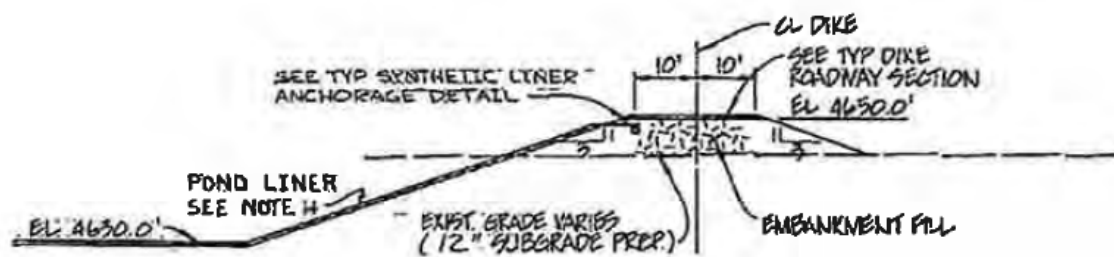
Existing Typical Wastewater Basin Cross-Section
